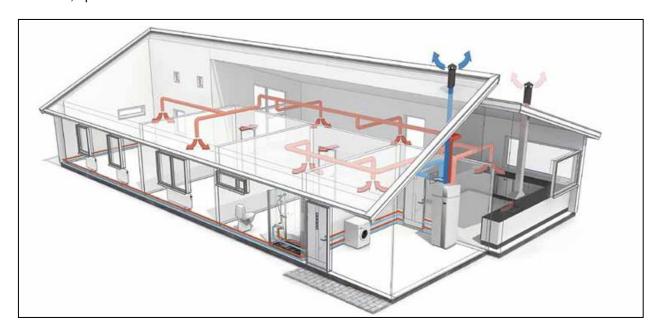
Example Diagram of Typical Exhaust Air Heat Pump Layout
